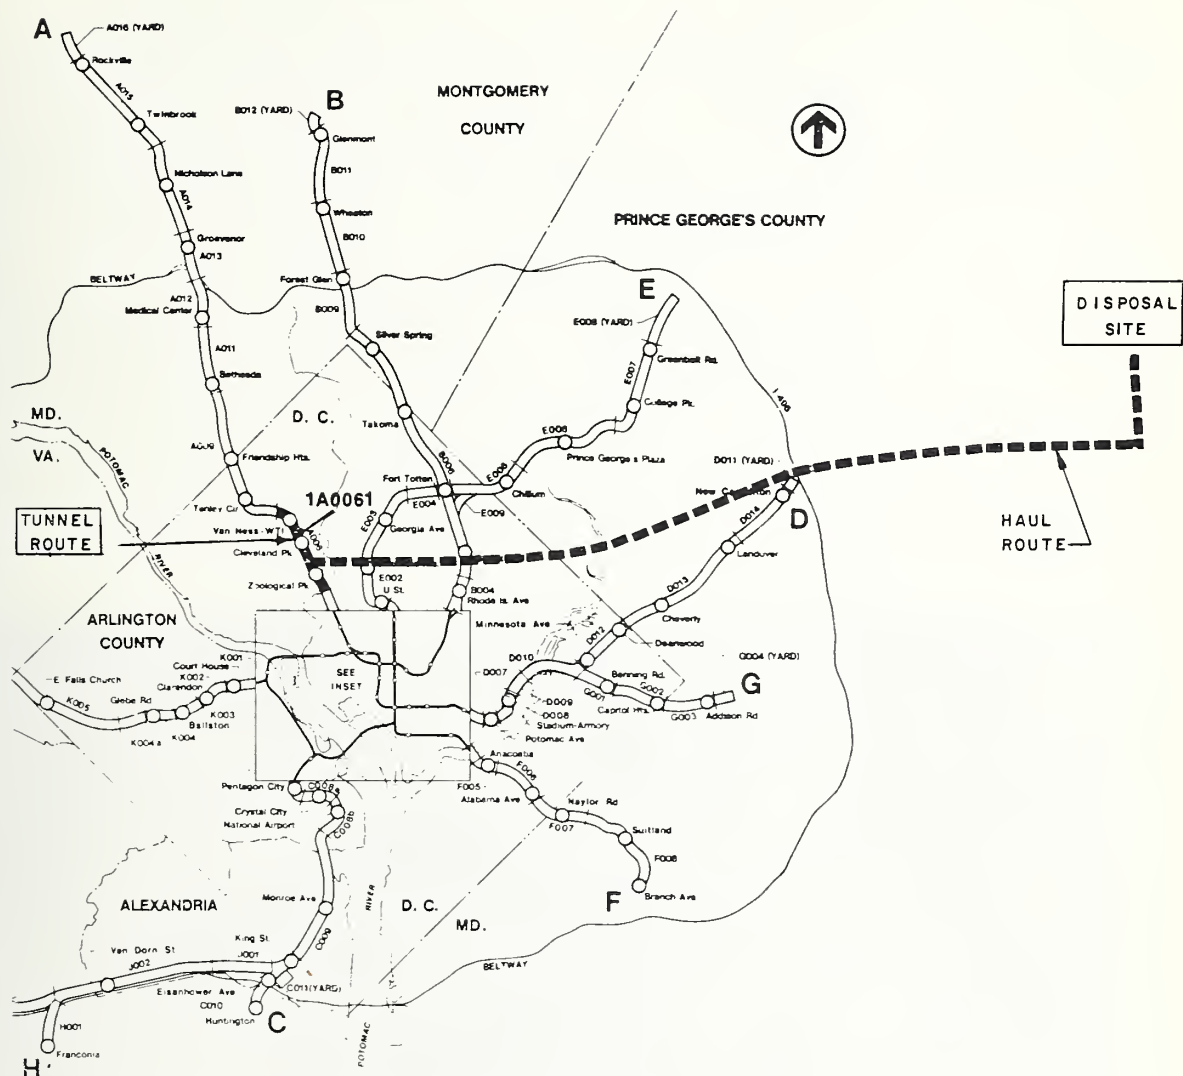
LOCATION PLAN - METRO CONTRACT A6a
